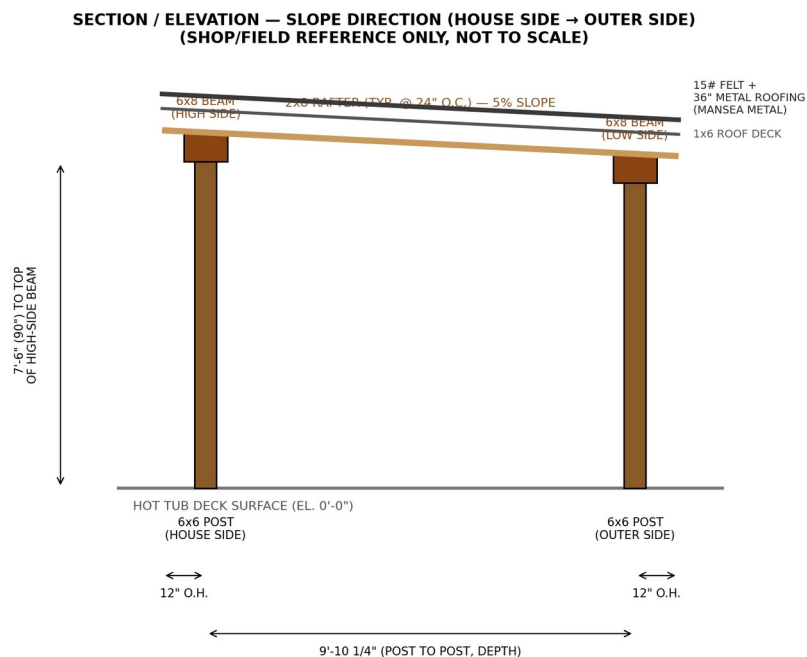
Section/elevation through the slope direction, showing post height, 5% slope, roof assembly build-up, and the 12" overhangs at both ends.
